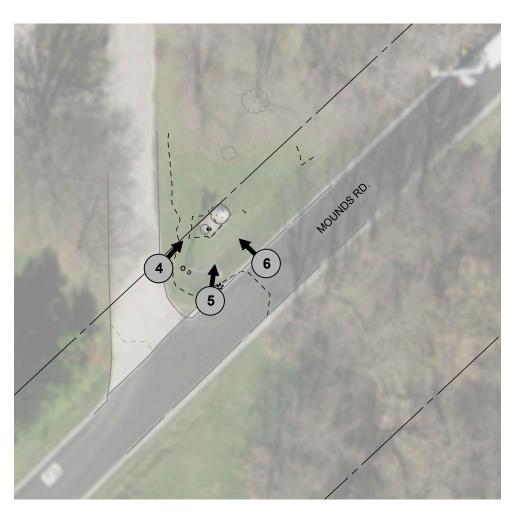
PHOTO LOG PLAN VIEW (MOUNDS ROAD LIFT STATION) SCALE: 1"=40'
